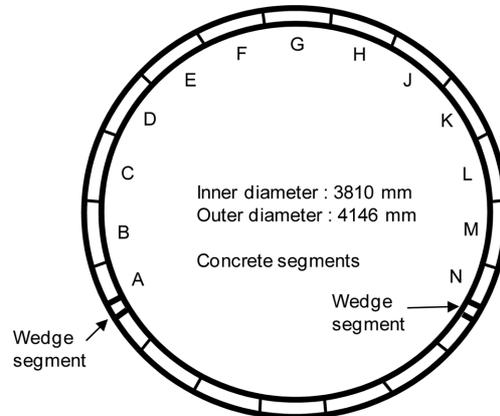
Expanded concrete tunnel on the Jubilee Line between Baker Street and Bond Street stations
